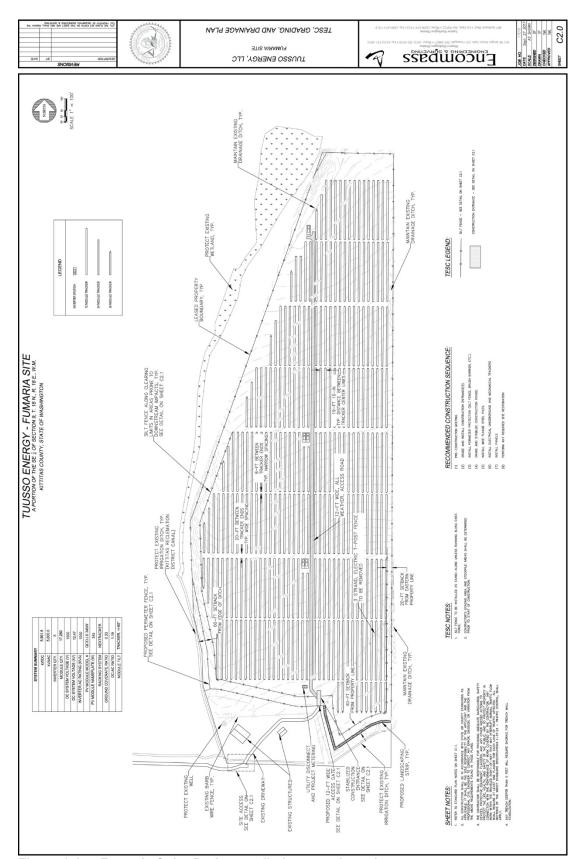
Fumaria Solar Project preliminary project plan.
